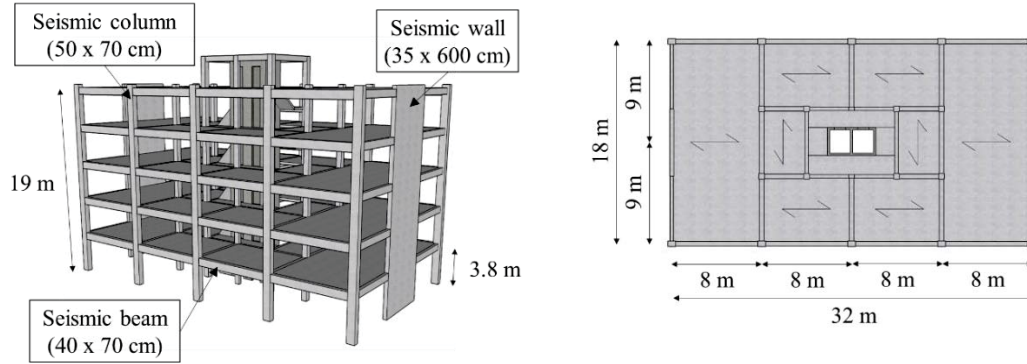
Multi-story case-study RC building (modified after Bianchi et al. 2021).
